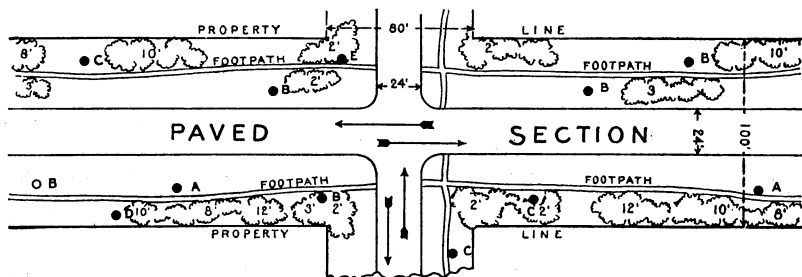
A 100-foot right of way with a 24-foot improved section, leaving 37 feet on each side in which the plantings are made informally. The footpath winds along the plantings. The figures in the groups indicate the height of plants that would be appropriate.
